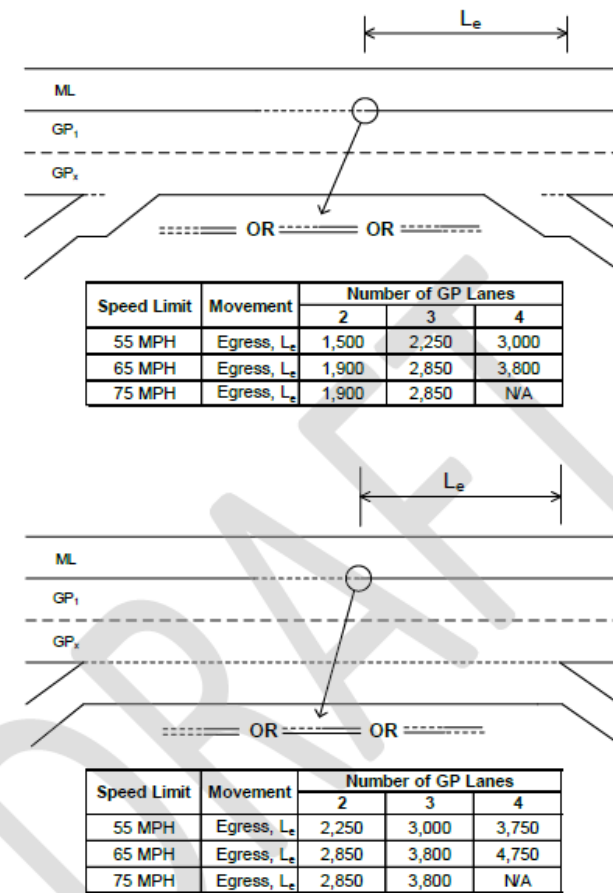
Recommended Minimum Access Zone Spacing to Downstream Ramps
